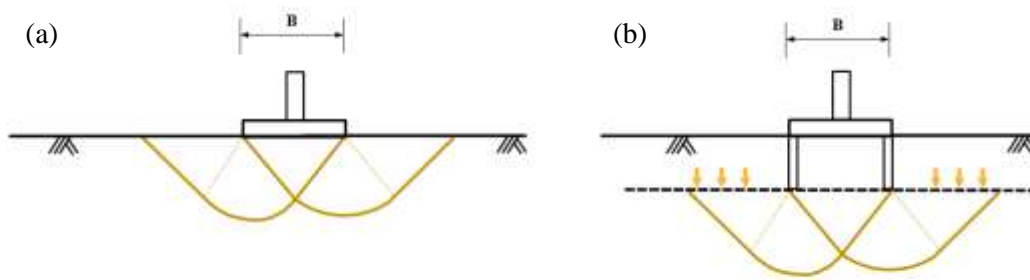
Failure surfaces developed beneath different types of foundations: (a) conventional shallow footing; (b) vertical skirted footing, in which the failure surface is shifted downward to the skirt tips [adapted from Bashir and Jakka, 2024a]
